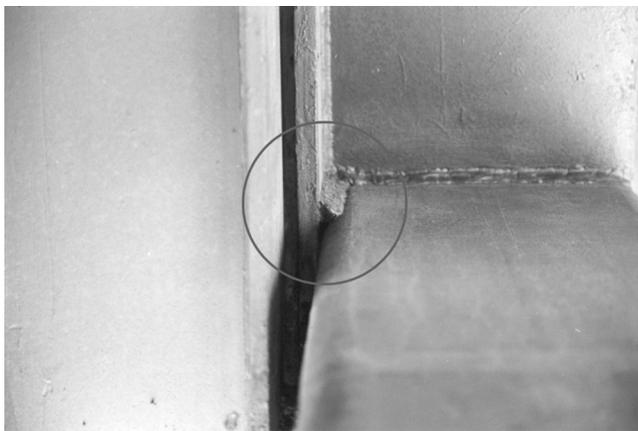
A Flare Bevel Groove Weld in an HSS Structure.
